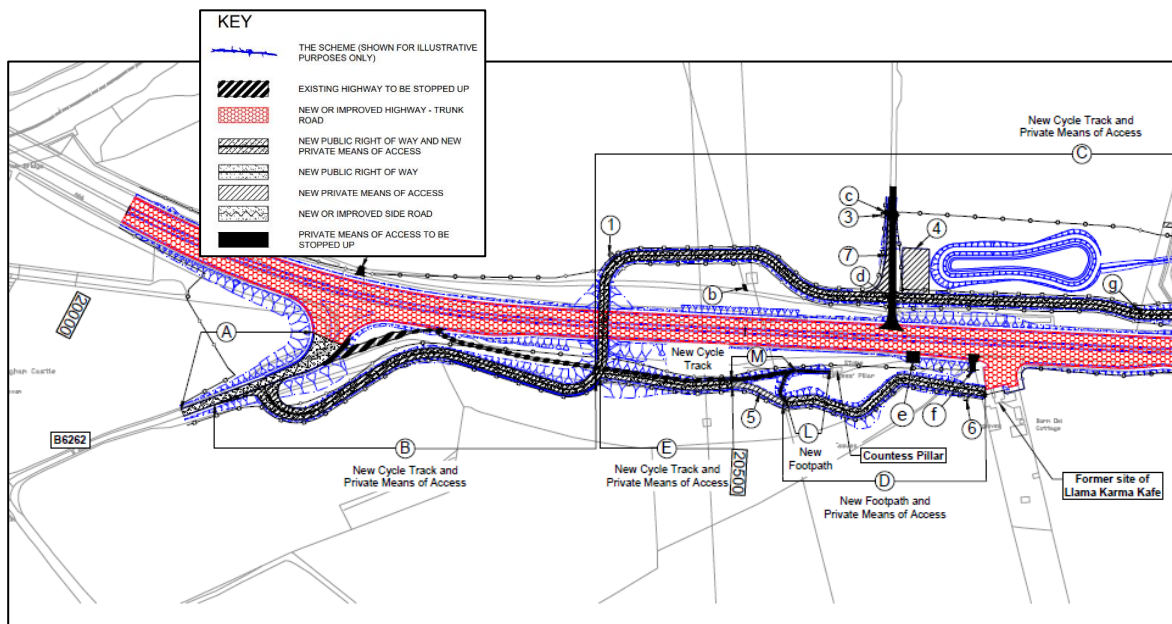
(e) Extract from Rights of Way and Access Plans (After)
